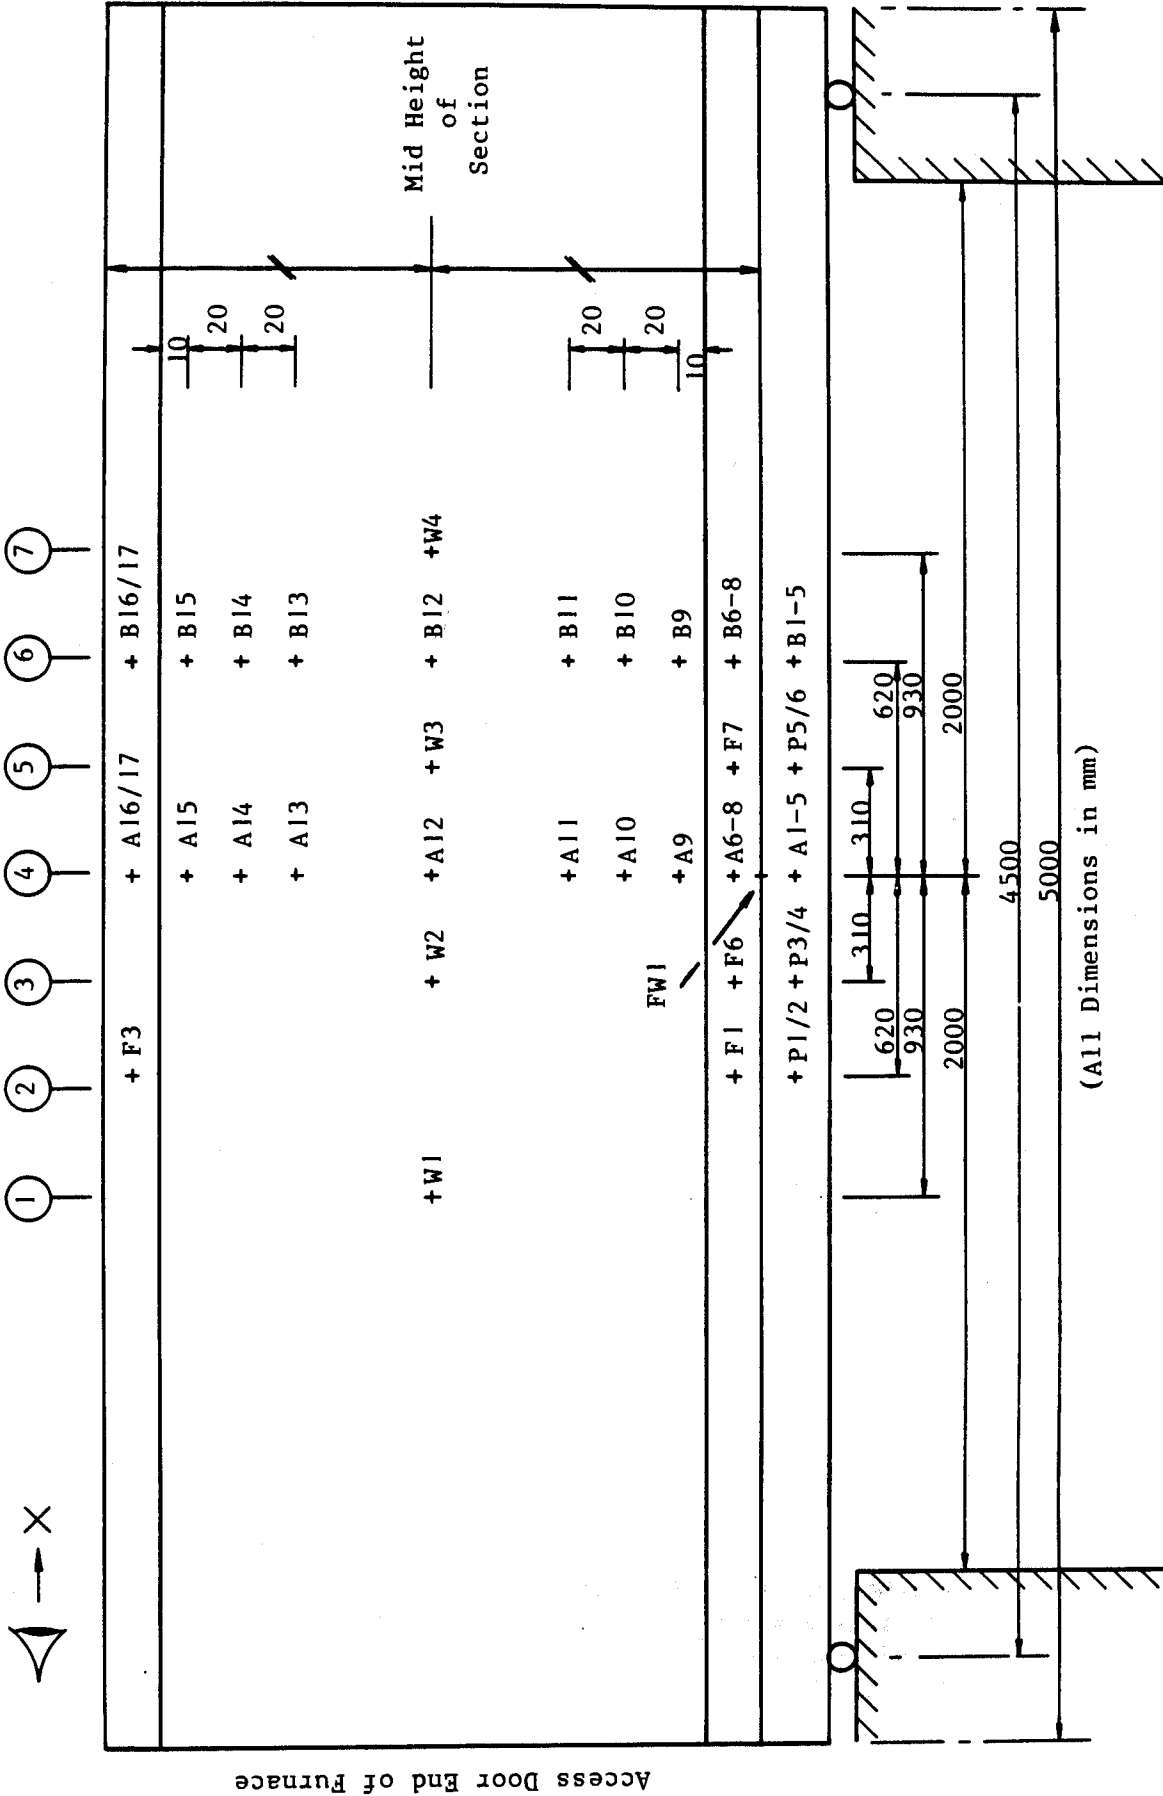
THERMOCOUPLE POSITIONS IN THE STEELWORK - LONGITUDINAL ARRANGEMENT (R4/24)
